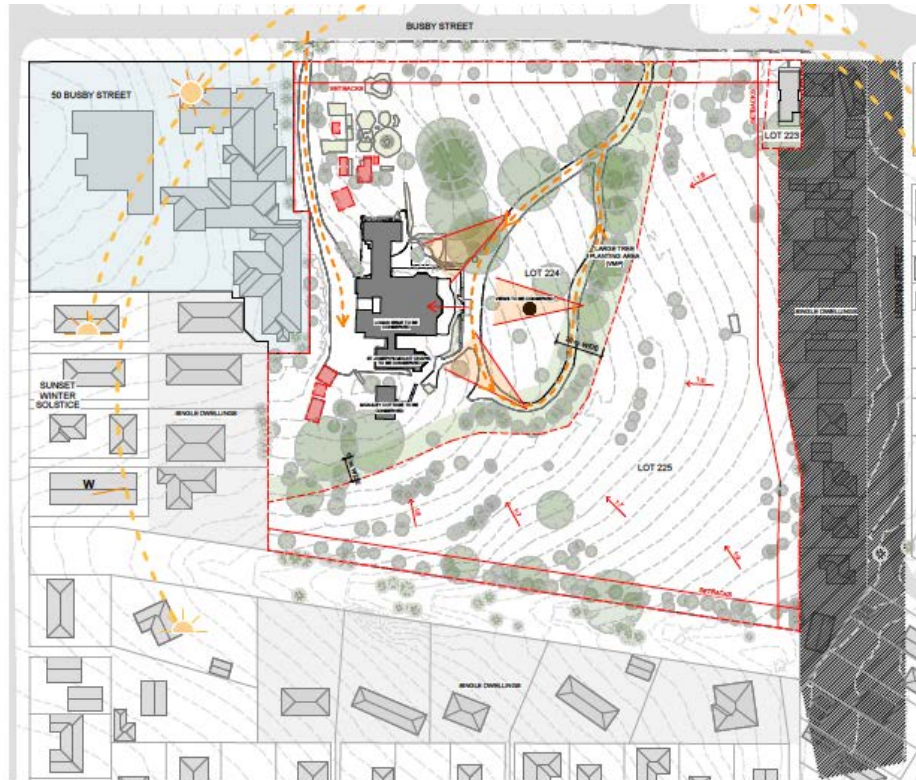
Site plan showing proposed works. Items highlighted in red are to be demolished location of structures to be demolished. (Marchese Partners/Life^{3A} 2024)
